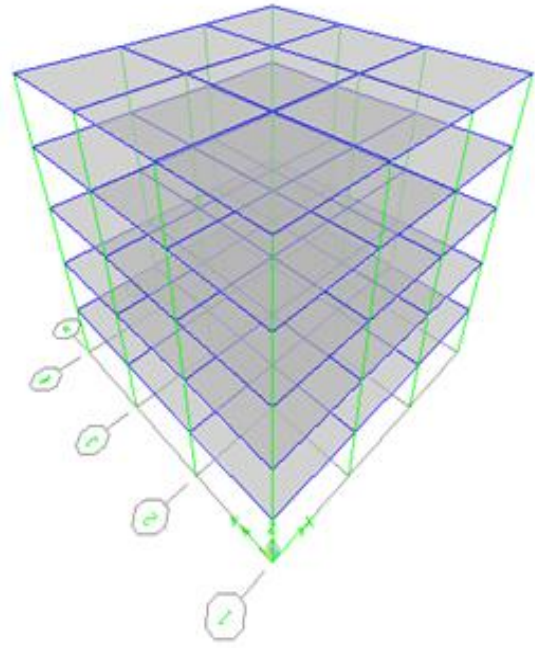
3D Model of G+5 Storeyed Building without Walls
